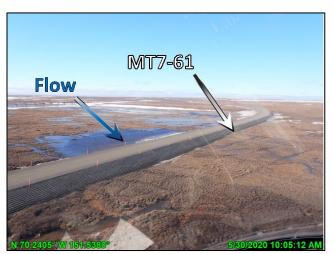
Ponding near culvert MT7-61 looking north; May 30, 2020
